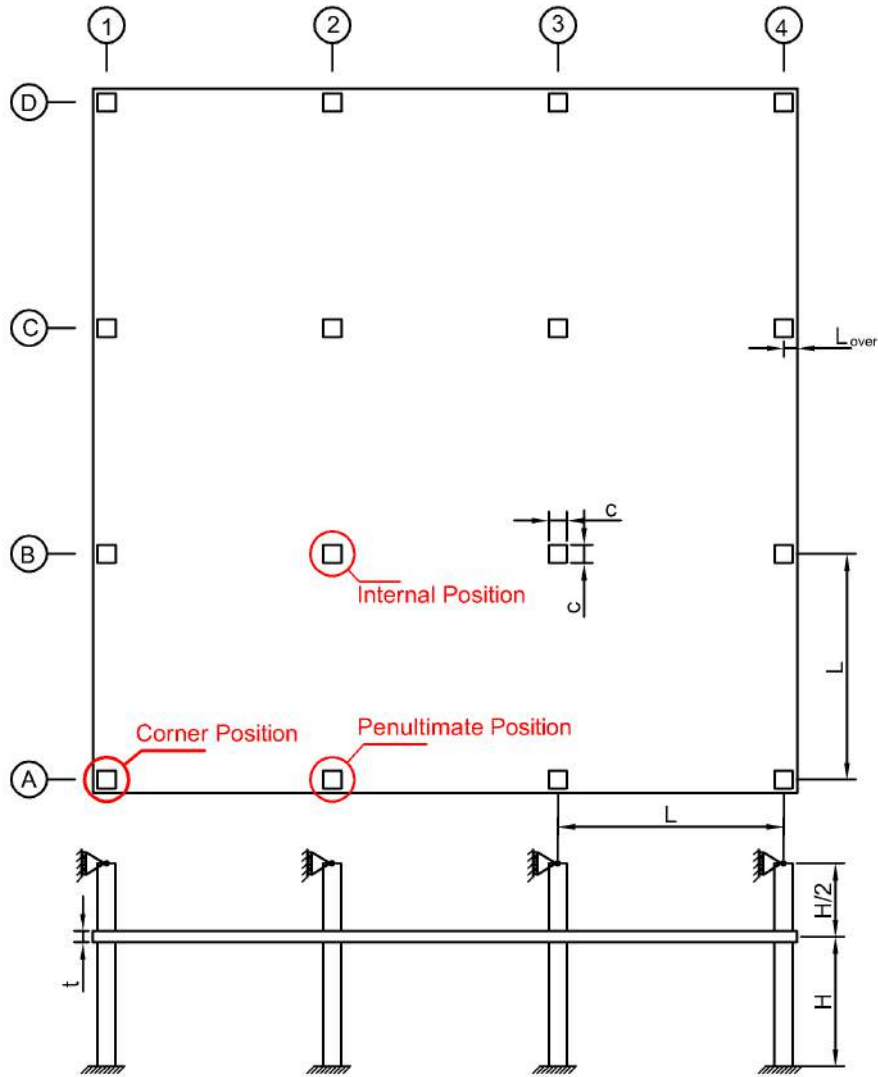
Plan and elevation of floor slab for parameter study showing dimension labels, key column locations and grid markings
